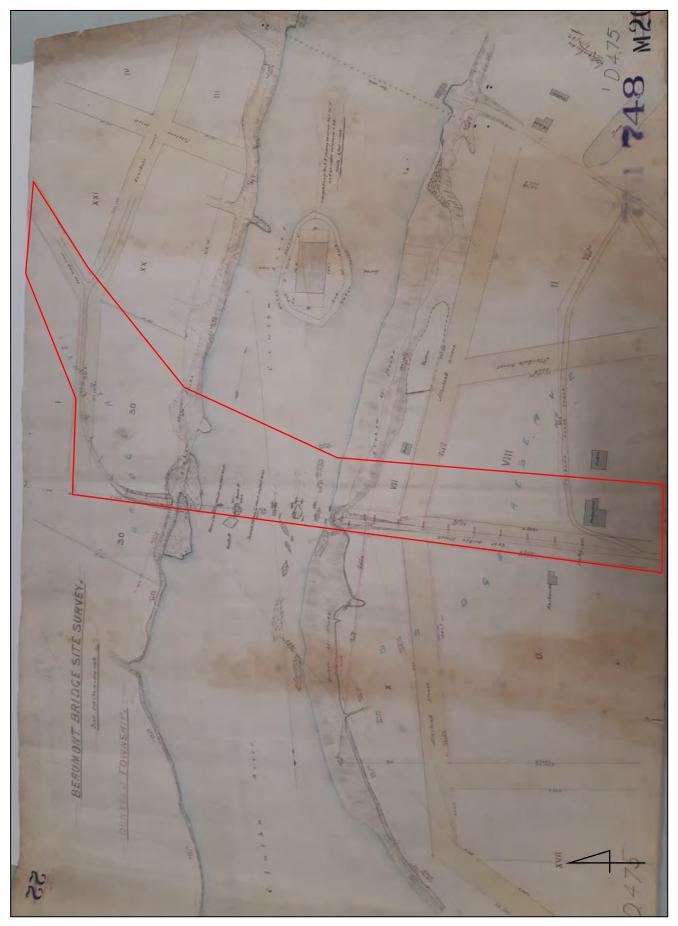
Beaumont Bridge Site Survey 1882, orientated east (project area in red; source: Archives New Zealand)
